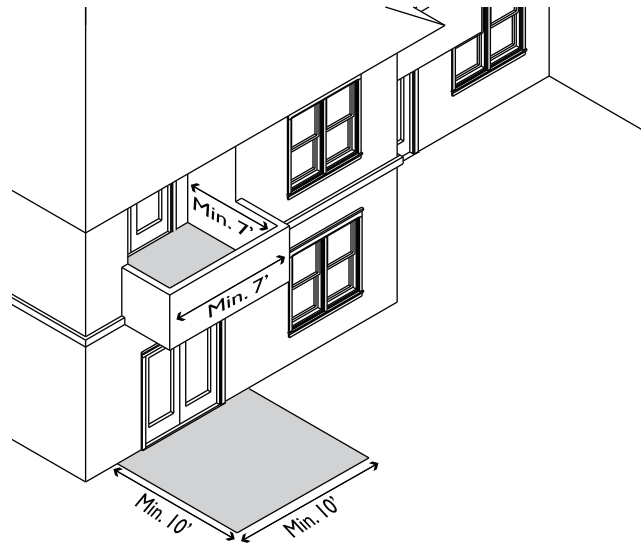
Townhomes: Front Yard Paving and Gates
